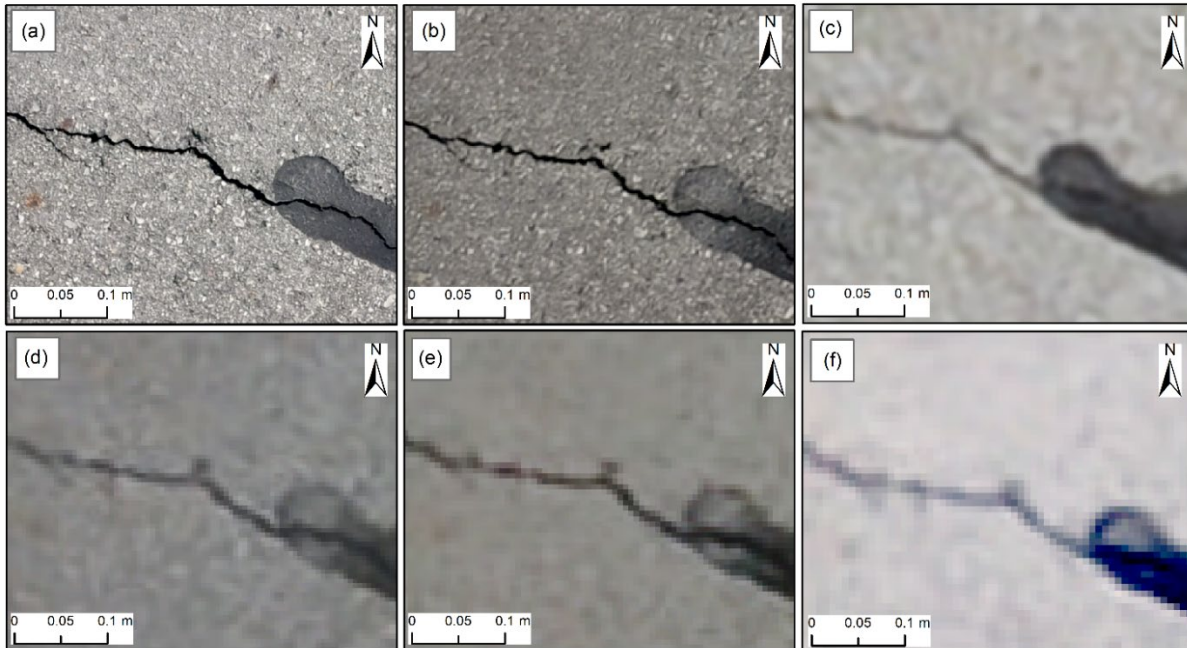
Unsealed L&T Cracks (M) and Weathering (L) on Asphalt Overlay Over Asphalt Concrete Pavement at TTF: (a) 0.8-mm/pix Orthophoto, (b) 1.5-mm/pix Orthophoto, (c) 2.4-mm/pix Orthophoto, (d) 4.9-mm/pix Orthophoto, (e) 5.6-mm/pix Orthophoto, and (f) 7.2-mm/pix Orthophoto
